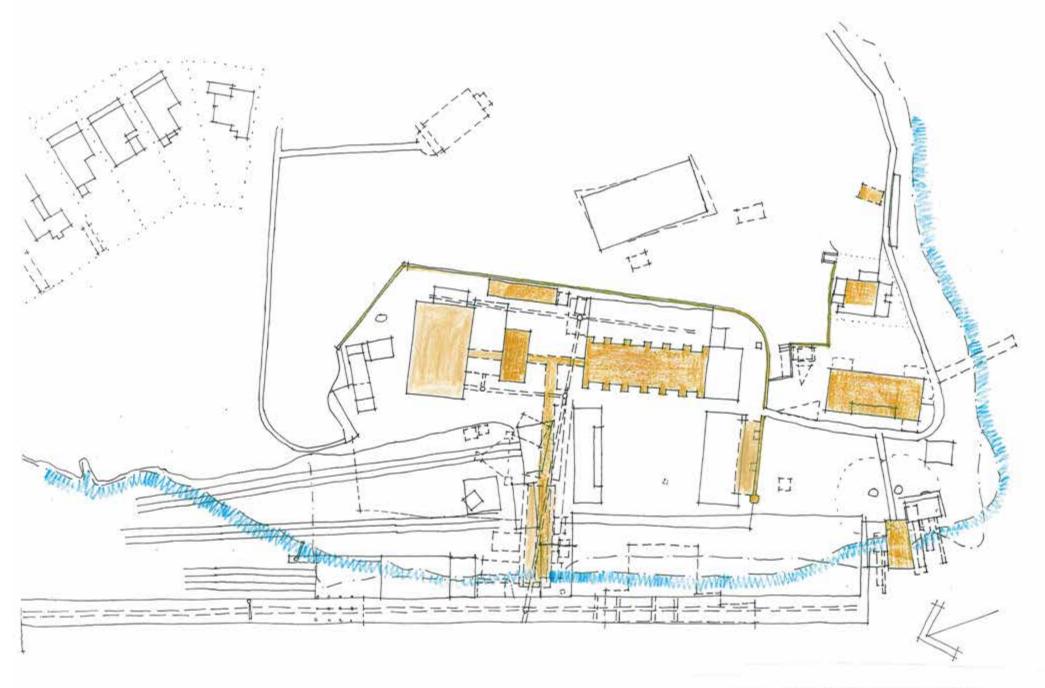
Site Plan of southern end of Goat Island: based on 1902-05 survey
